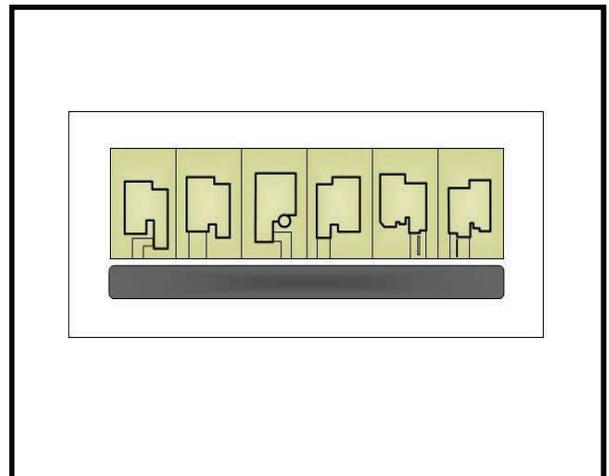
Façade Articulation Exhibit demonstrates a “staggered” street profile.
